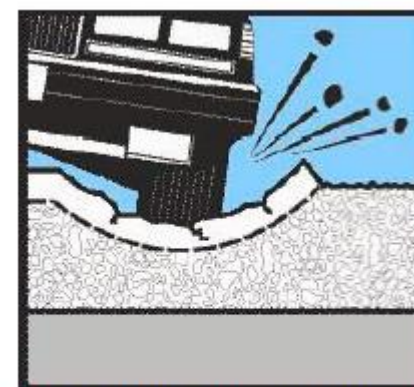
When traffic passes over this cavity, the pavement surface cracks and fails under traffic loading creating a pothole
